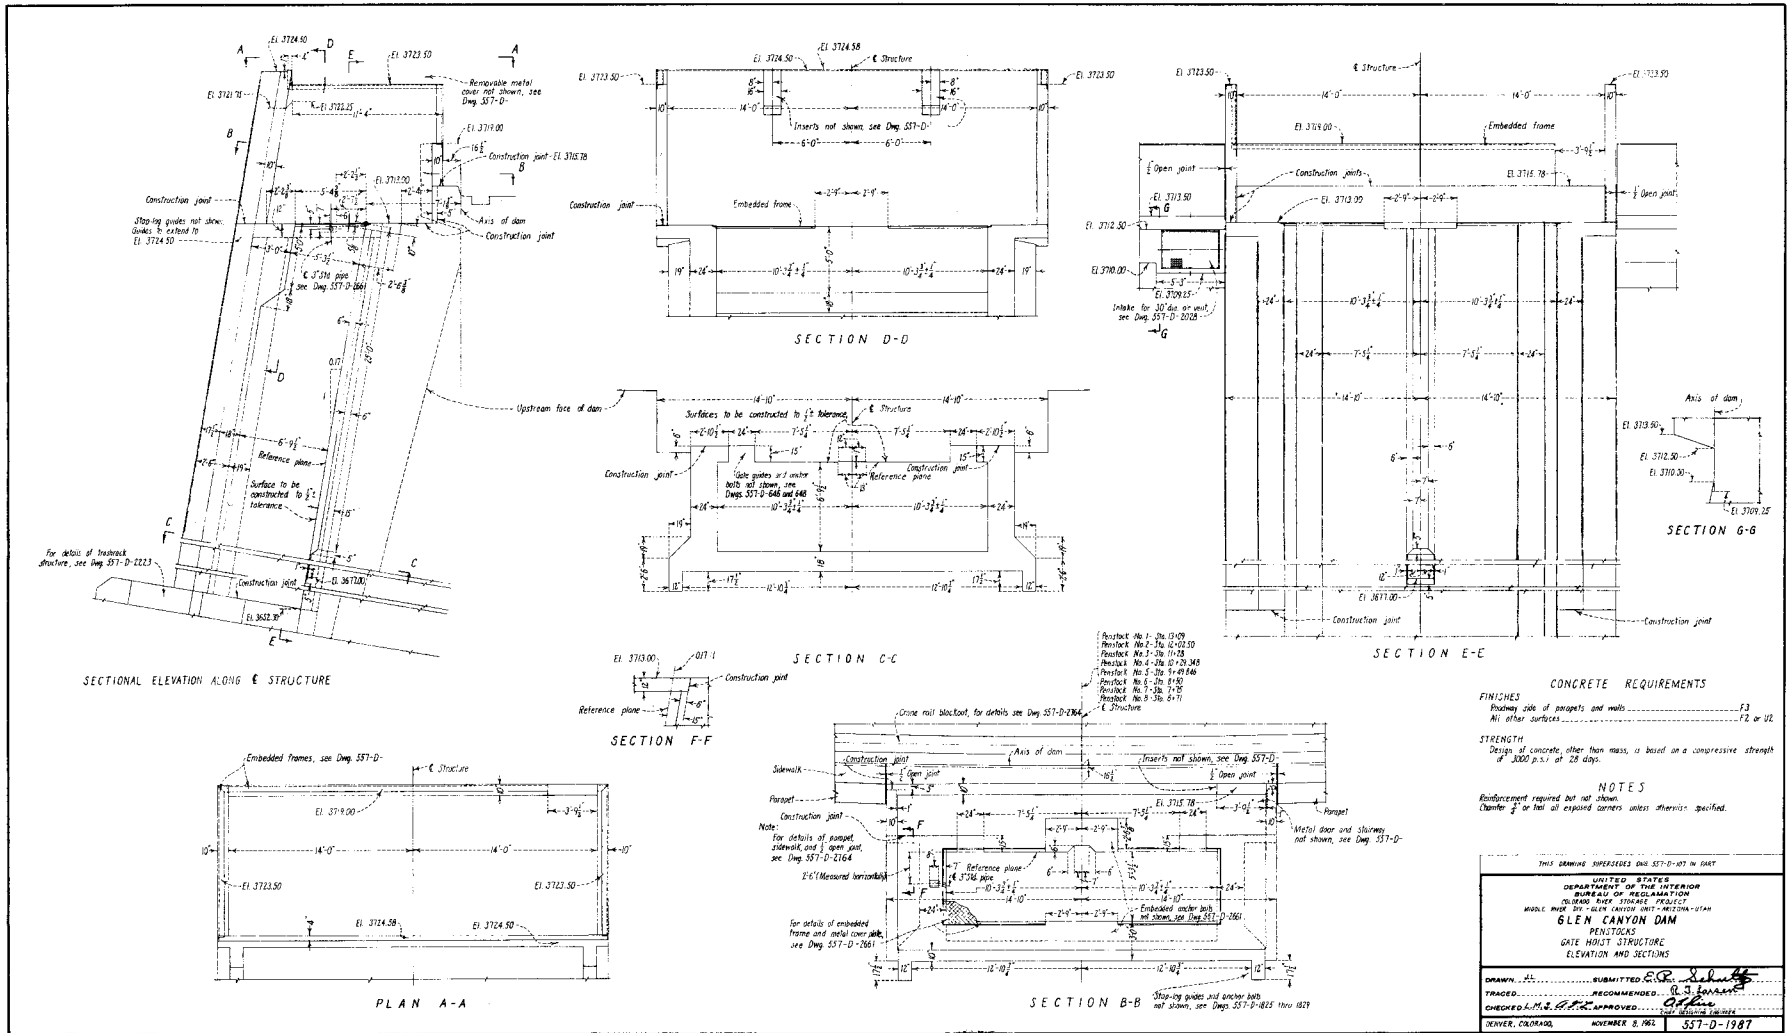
Penstocks gate hoist structure—Elevation and sections.
